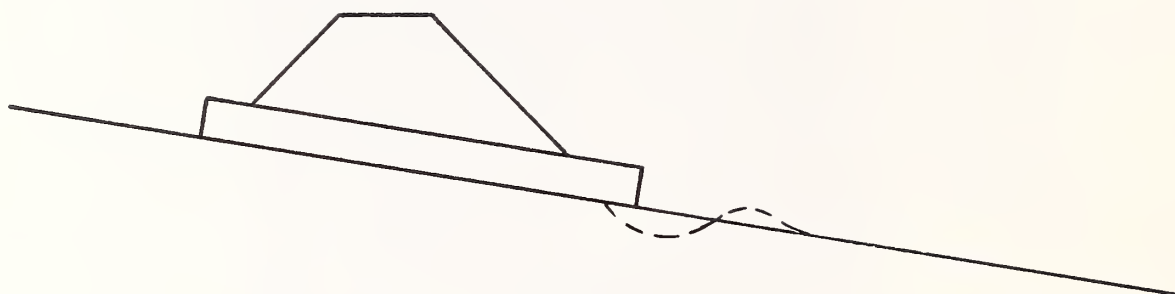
OUTLET SCOUR HOLE AT PROJECT CULVERT NO. 52
